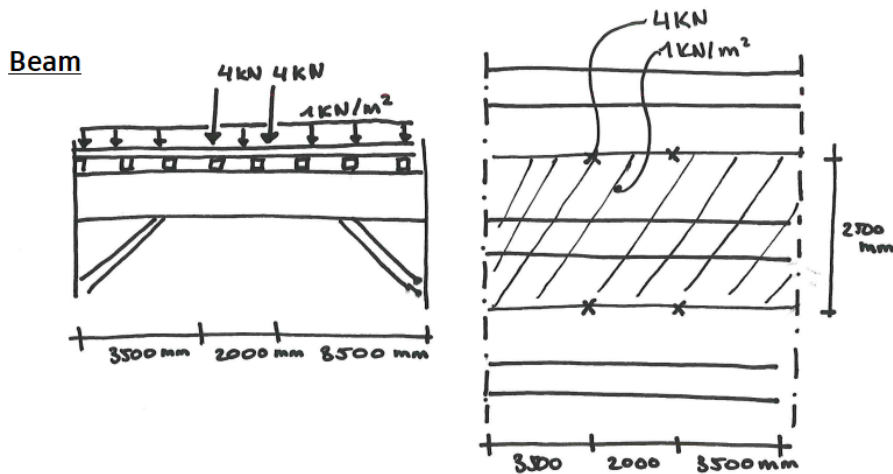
Load case 2 on the beam. Left: side view and Right: top view
